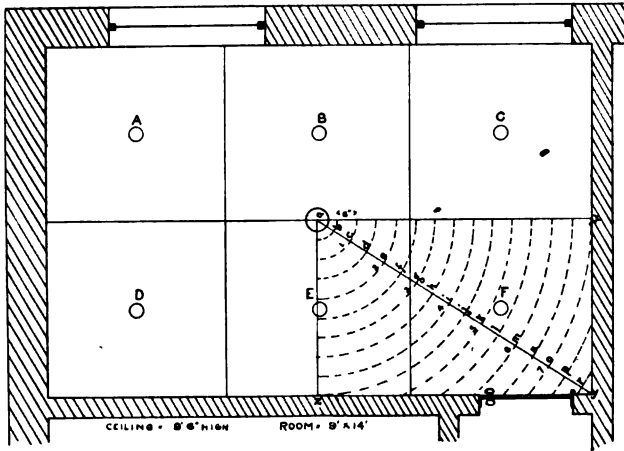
PLAN OF ROOM IN WHICH TESTS WERE MADE.
